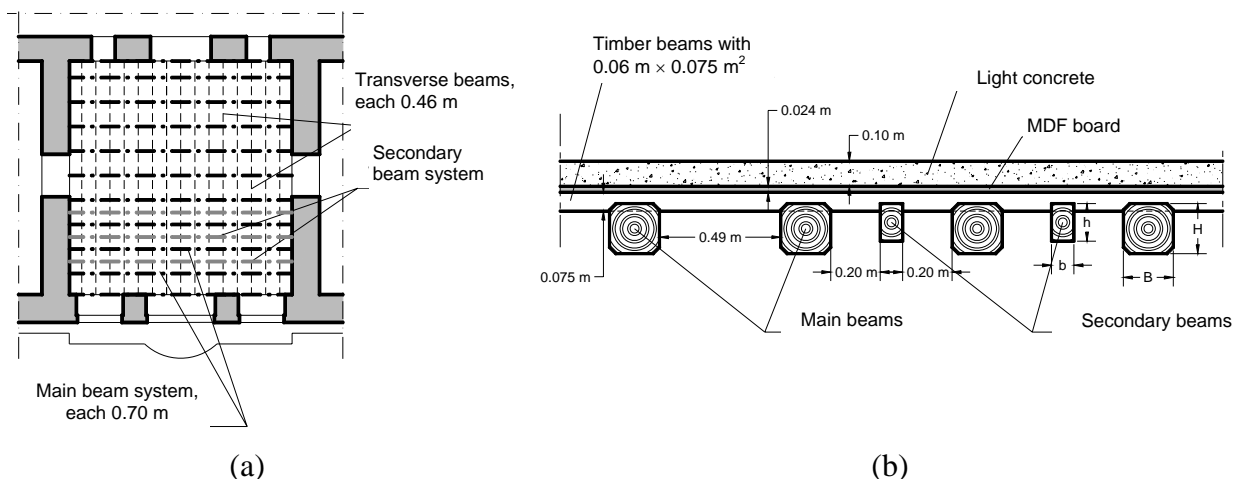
Arcos de Valdevez City Hall's floor structure: (a) plan; (b) cross-section
